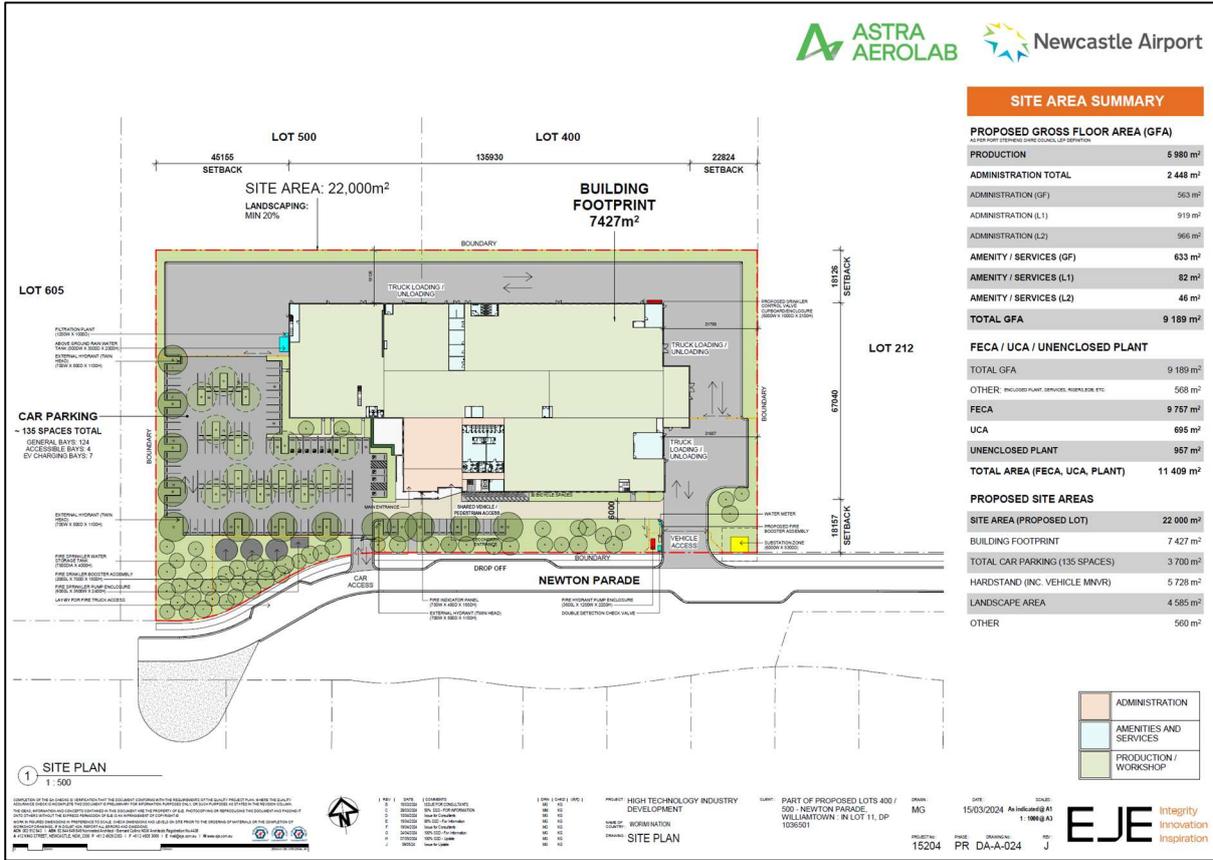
Site Plan. Source: EJE Architecture (May 2024)
